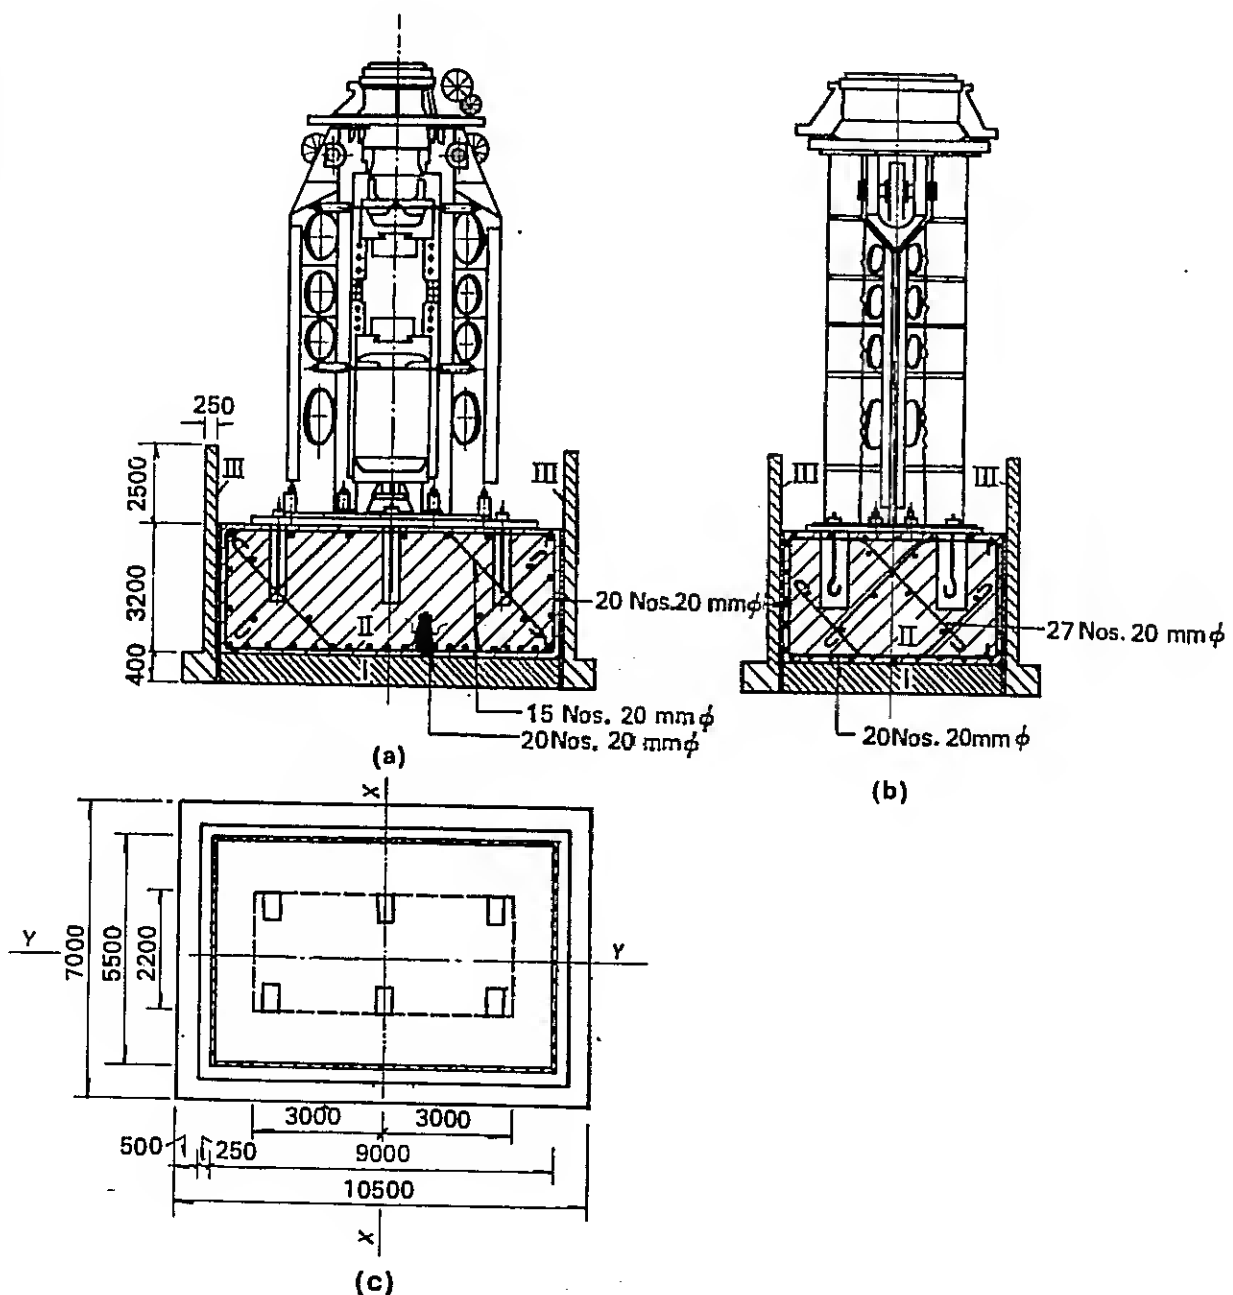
Foundation of a Counter-blow Hammer—(a) Section  $y-y$ , (b) Section  $x-x$ , (c) Plan.
